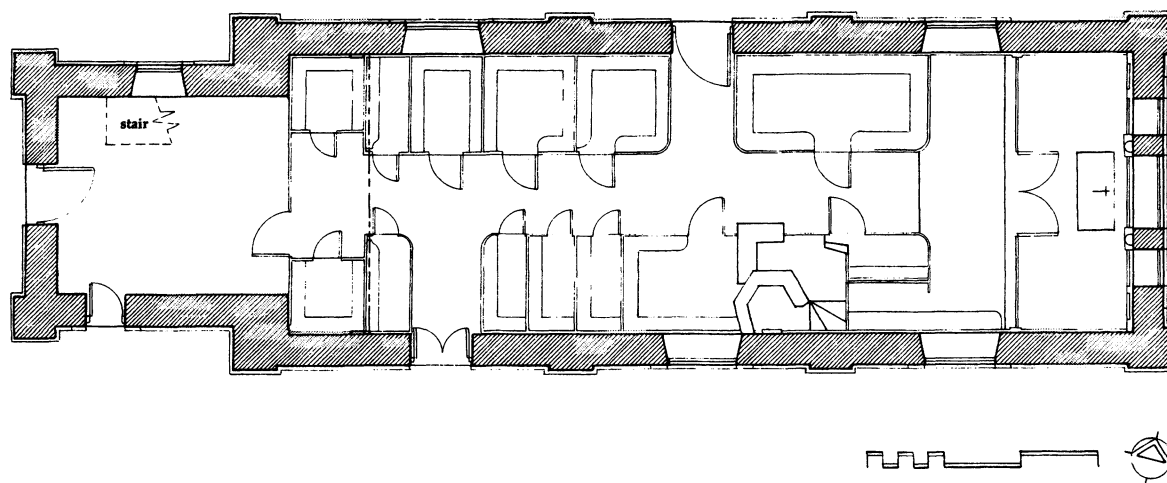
Plan of St. Mary's Church, Avington, Hampshire.
